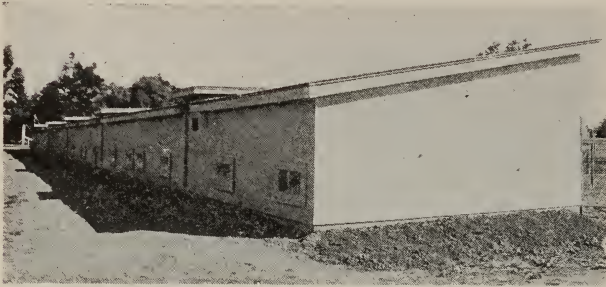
Rear view of laying house showing rear windows below droppings board.
